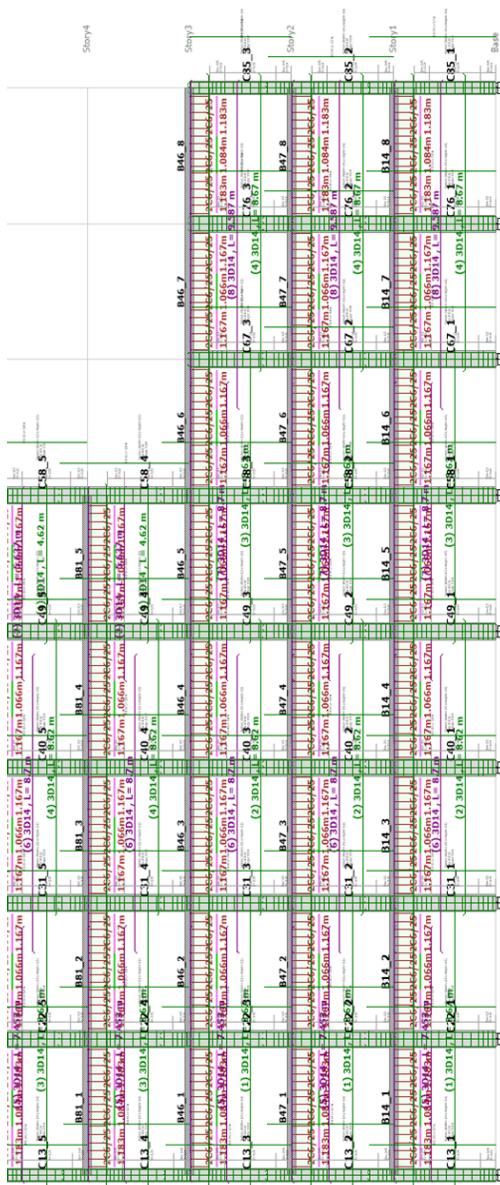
Reinforcement details, as shown in AMS in elevation view
